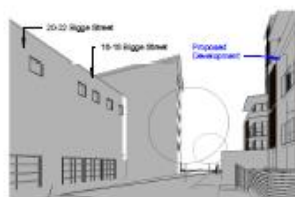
View of elevational shadows cast by the original proposal on the southern and western adjoining buildings
